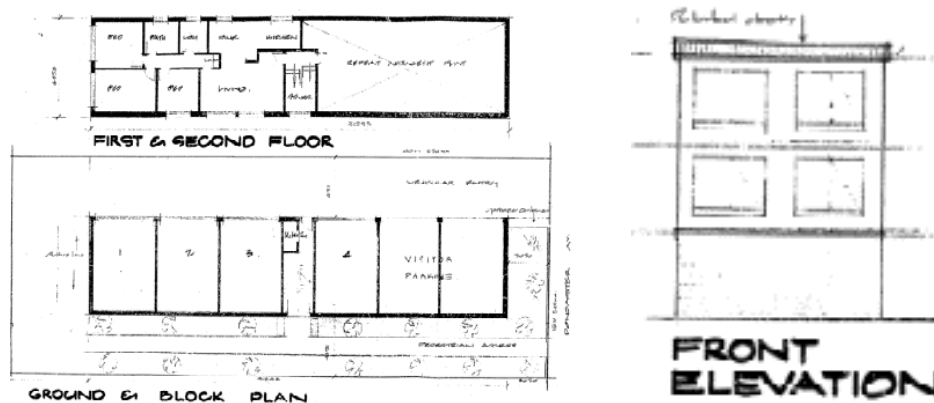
Existing approved floor plans and front elevation under DA/169/1974.
